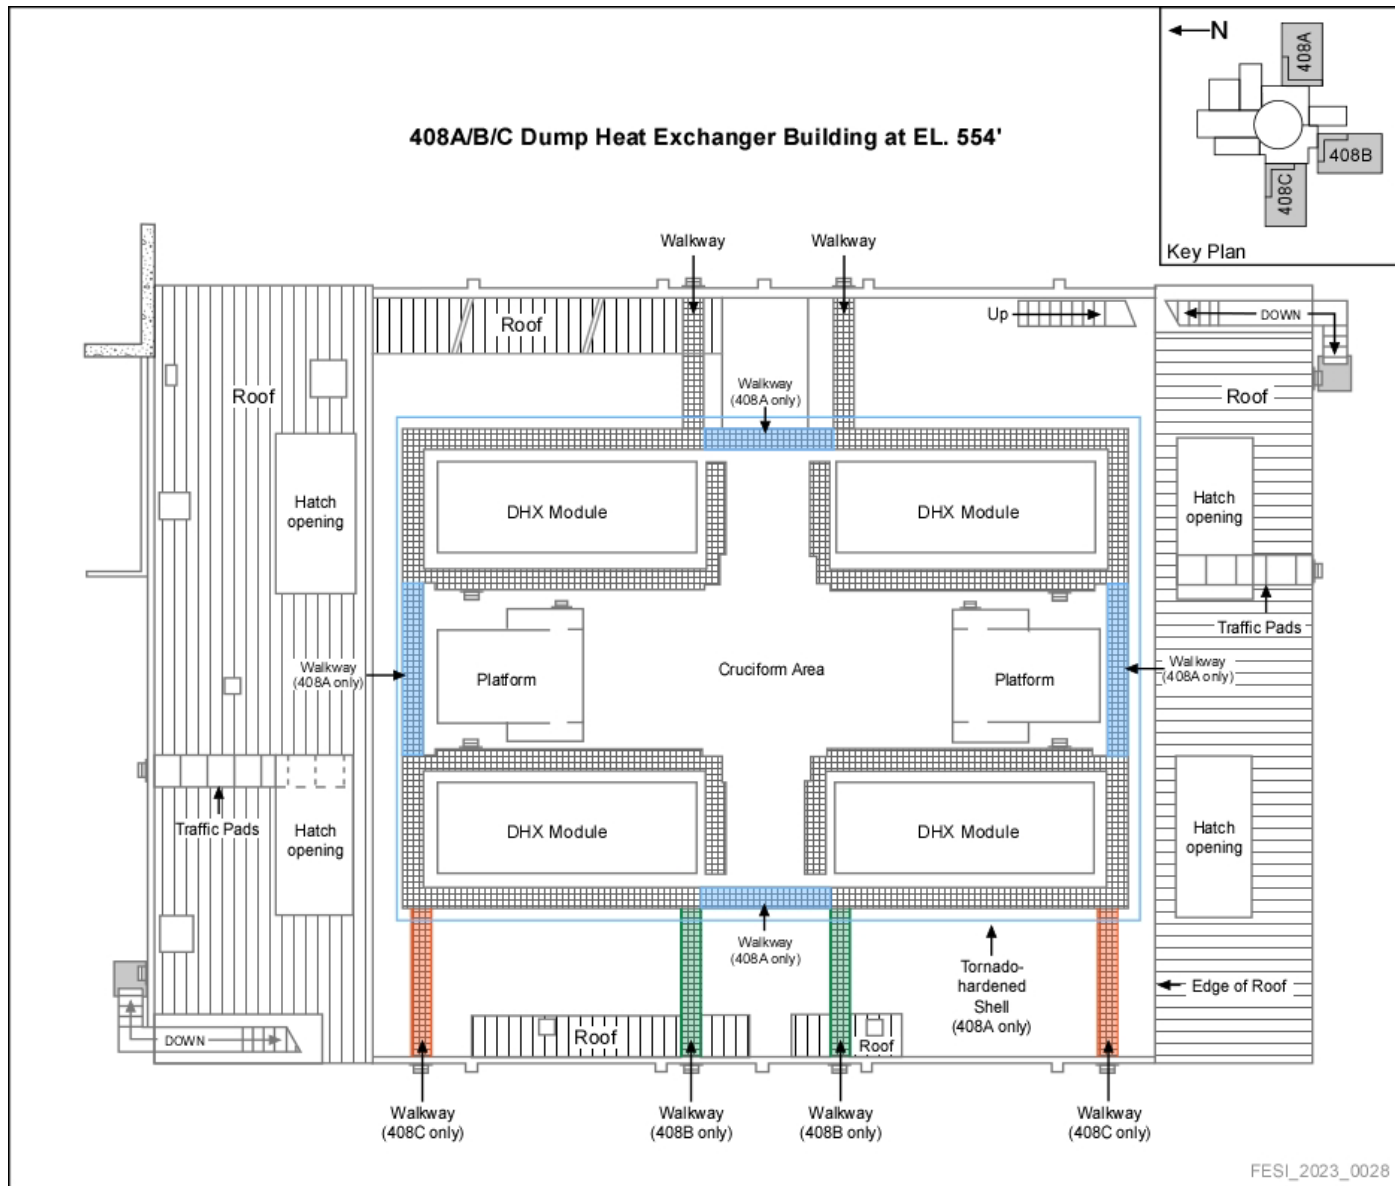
Plan View of 408A, 408B, and 408C Dump Heat Exchanger Structures (554 ft Elevation)
